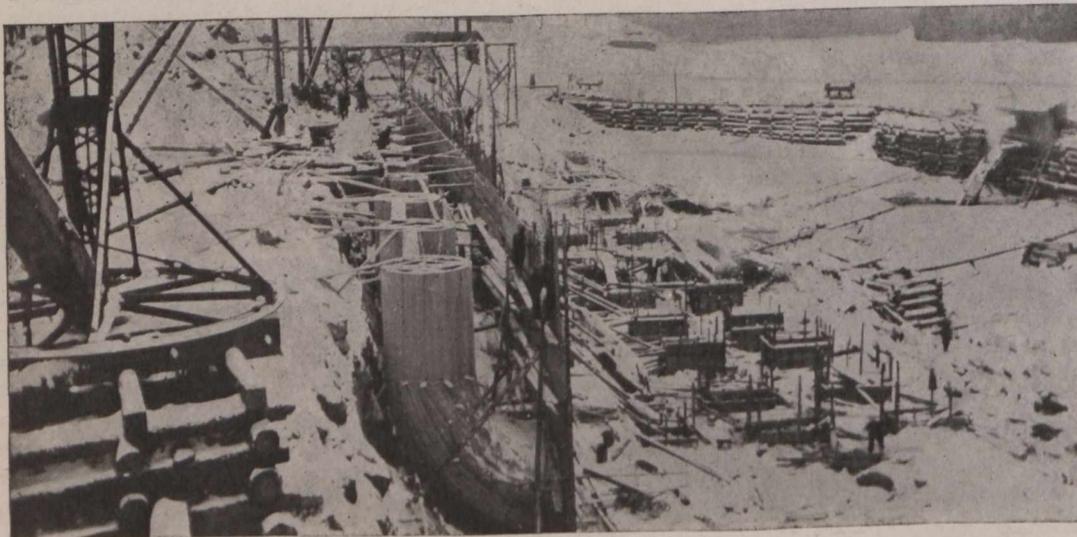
Power House Construction, Showing Draft Tube and Pier Forms and Cofferdam, Looking North.
